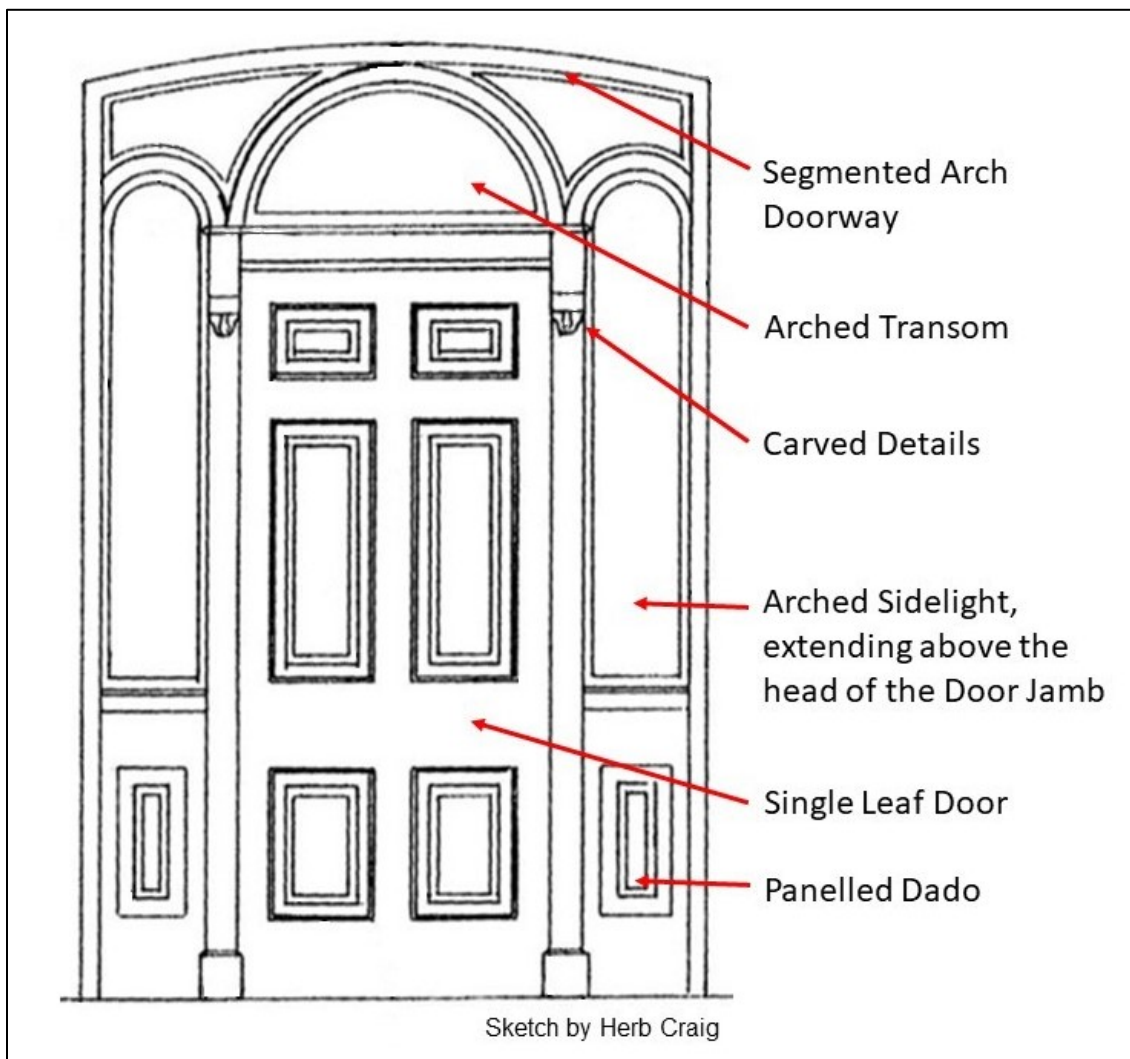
Labeled diagram of a London Doorway, showing typical panelled detailing found on a London Door. Courtesy www.londondoorways.ca.
